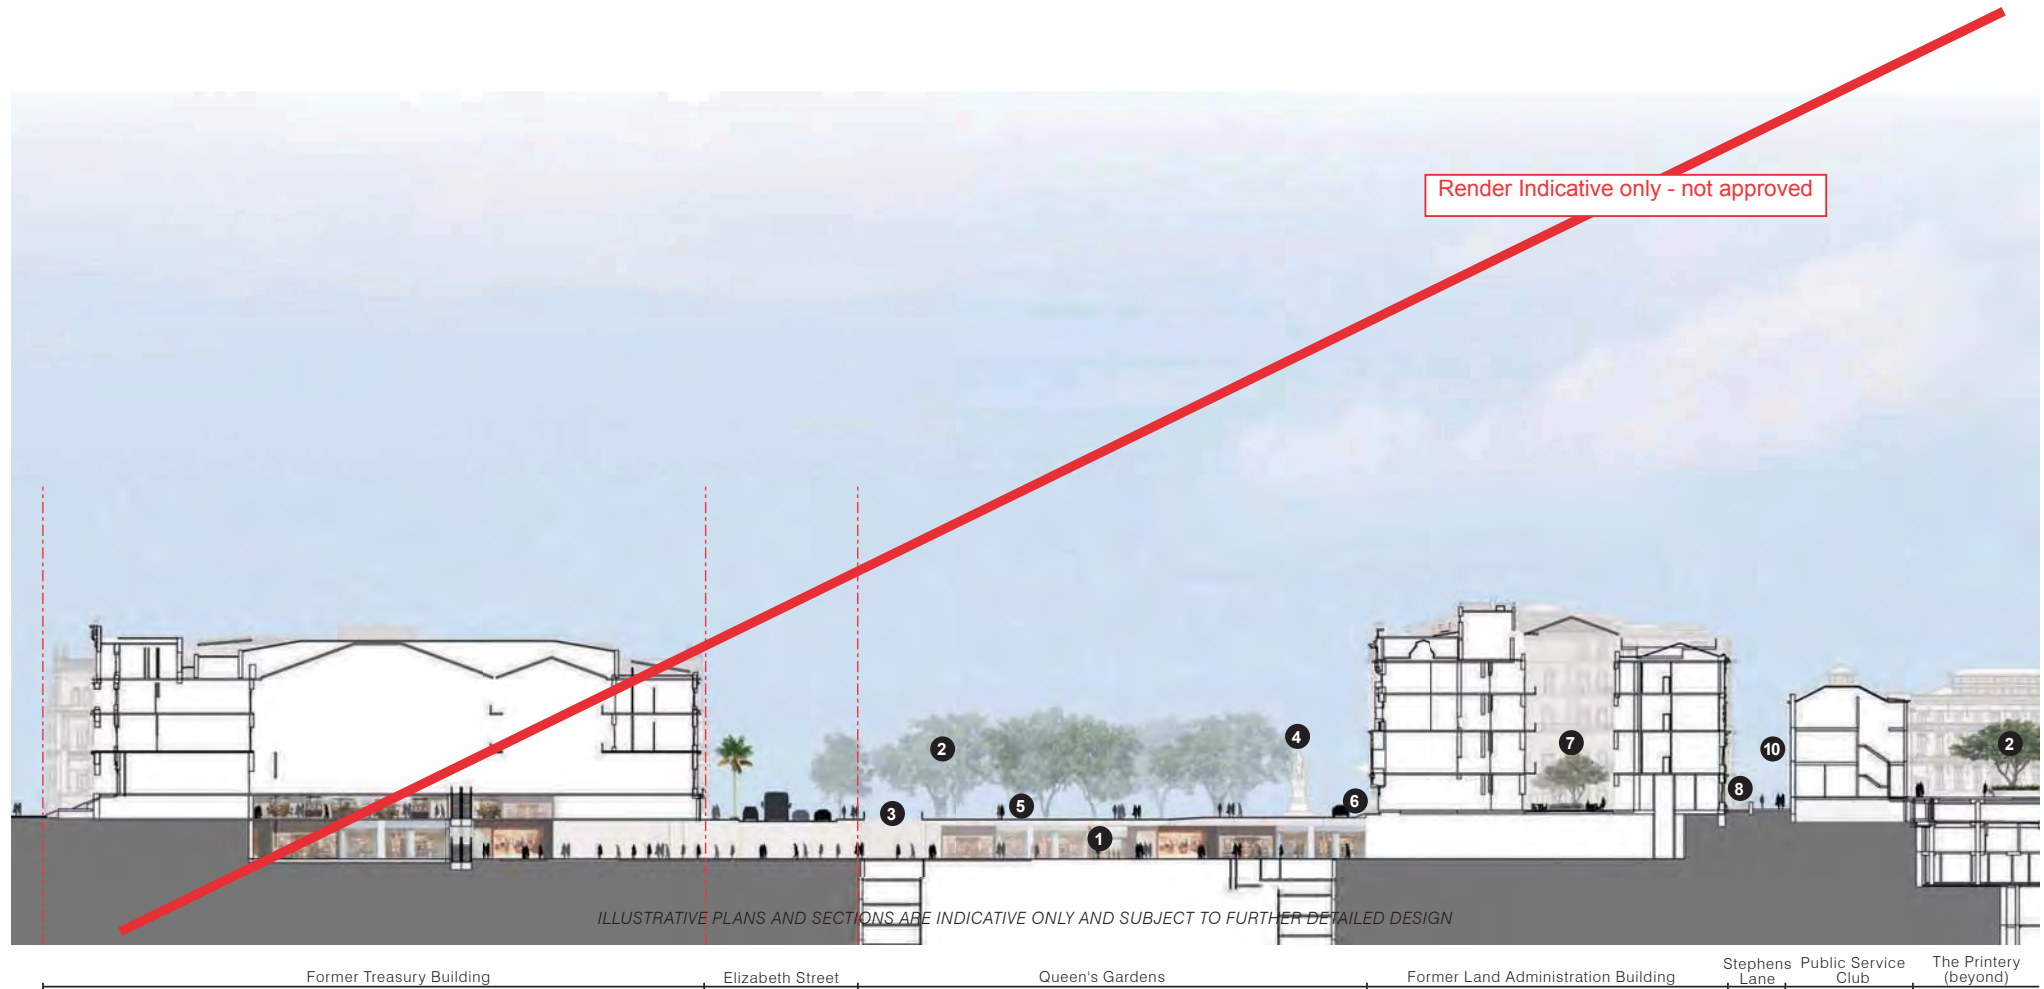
Sectional Elevation from George Street to the River (Not to scale)
